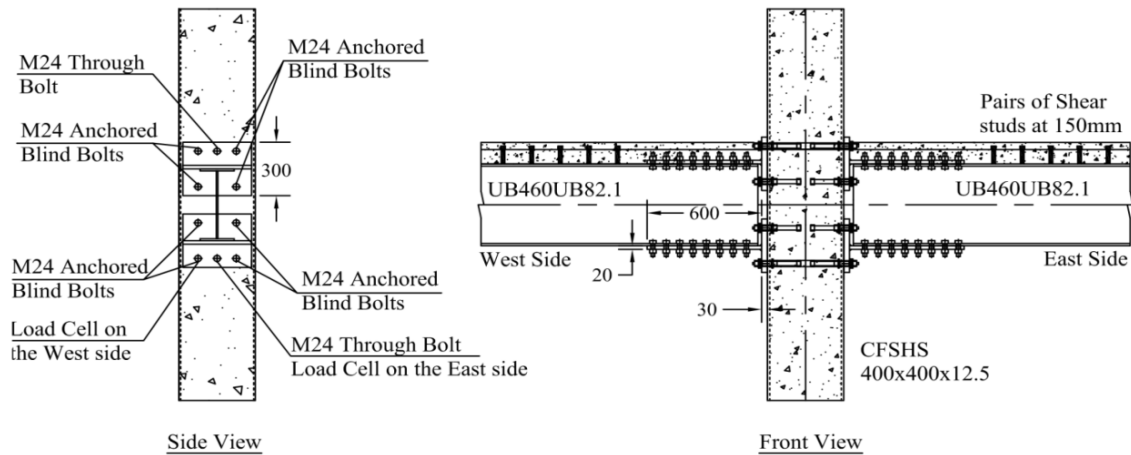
Proposed anchored blind bolted connection for the sub-assembly test
